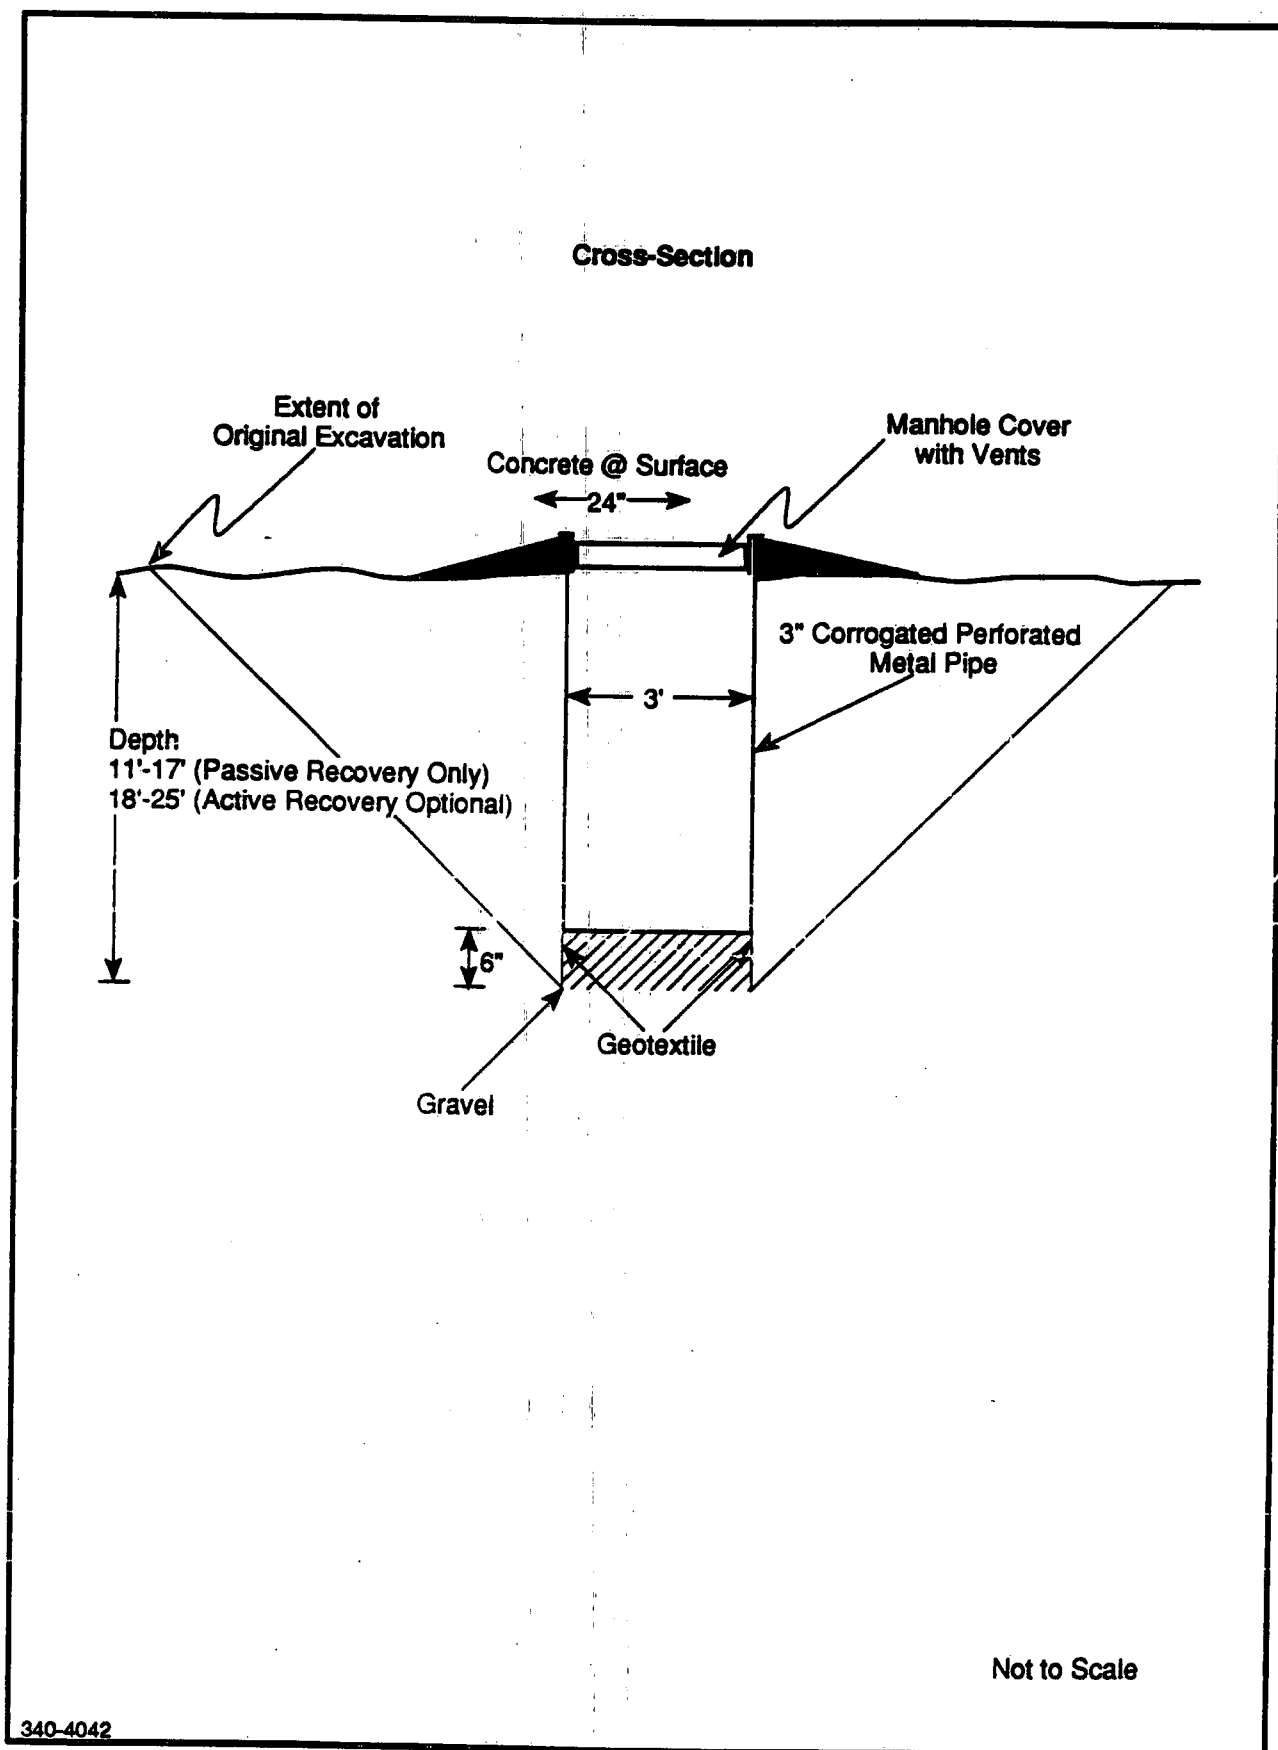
CAISSON SUMP ALTERNATIVE: CONSTRUCTION DETAIL
